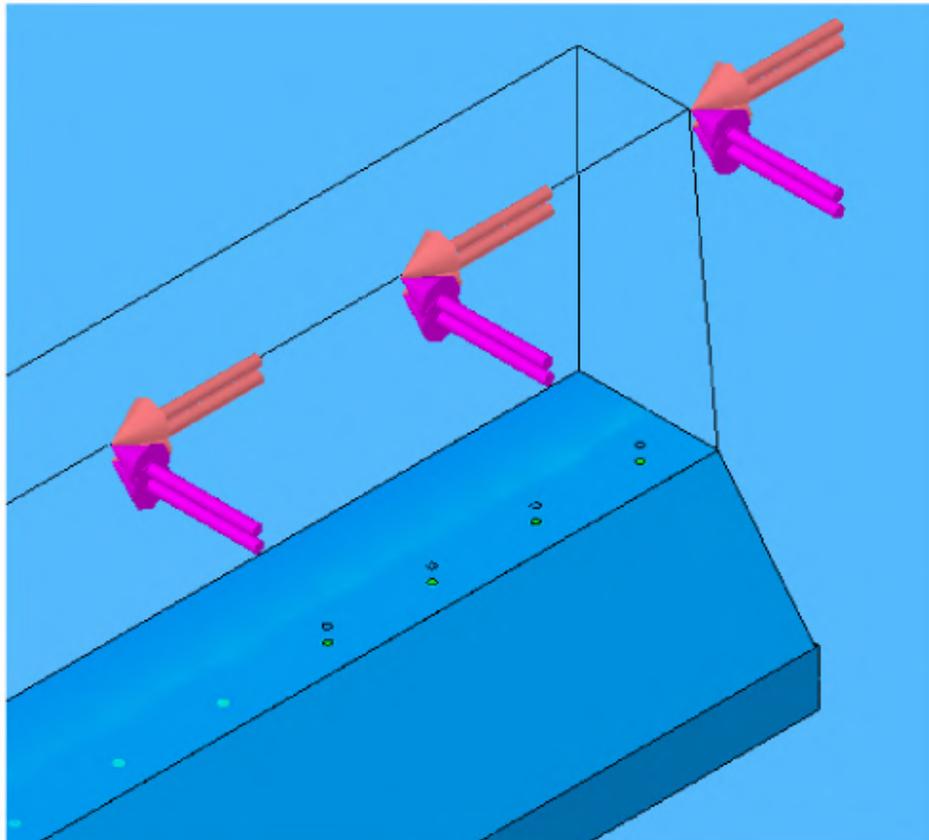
AASHTO loading designation for proposed parapet. (Top section of parapet shown as transparent to enhance viewing)
